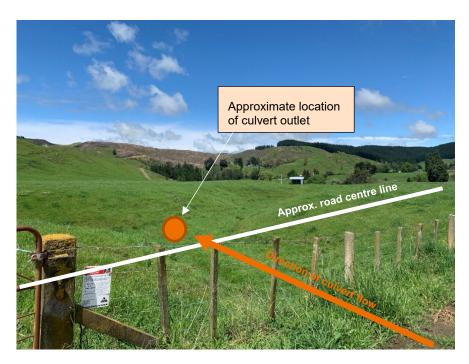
Proposed location of cross-drainage culvert C15290.
